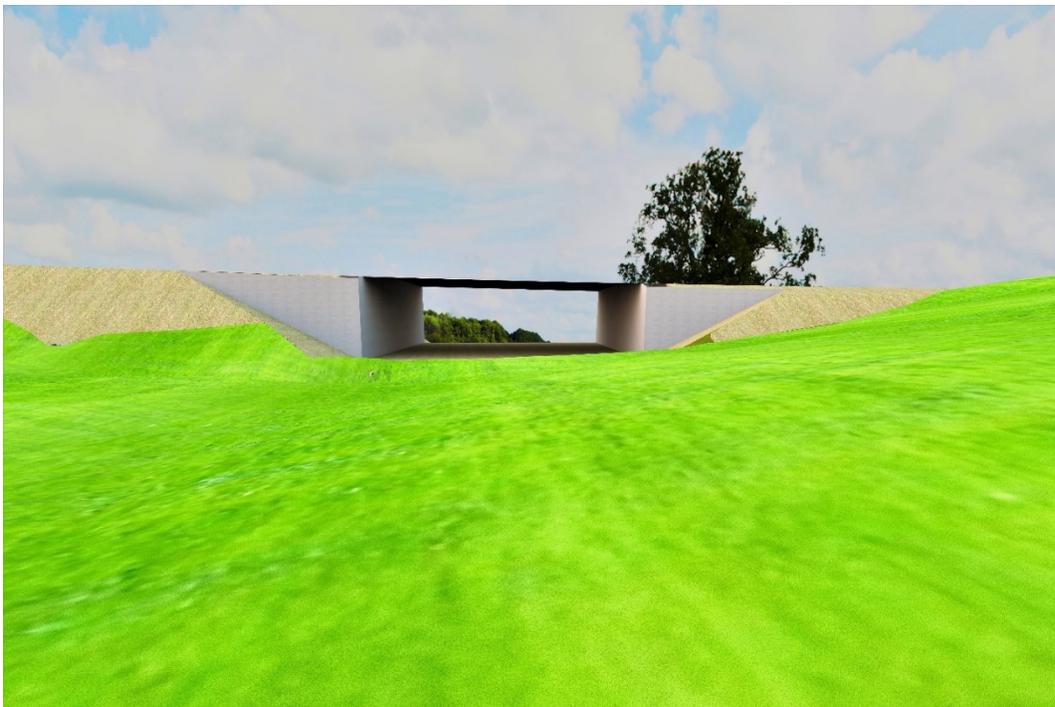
Simulation of Wildlife Underpass at MP 170.6, looking west.
